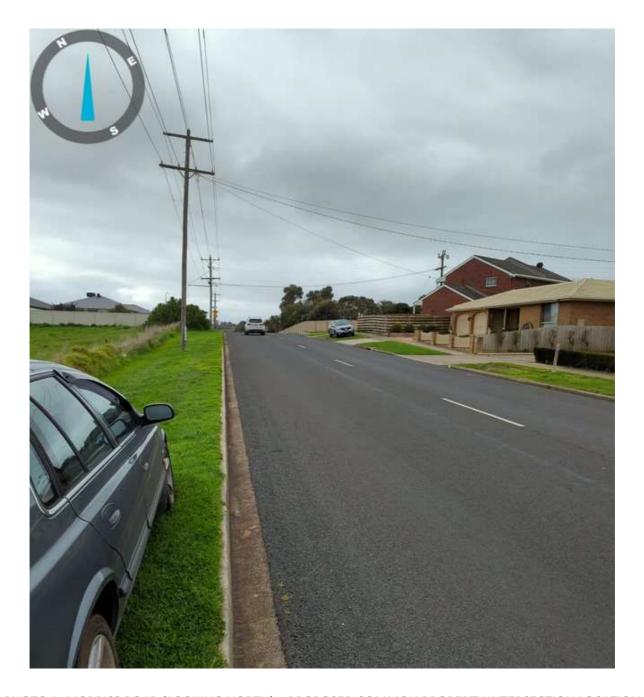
MORRISS ROAD (LOOKING NORTH) – PROPOSED COMMON PROPERTY INTERSECTION LOCATION
